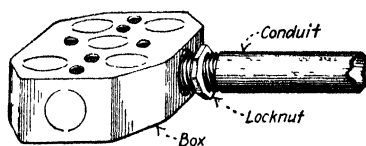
Connecting the ground wire with a locknut. First step, locknut screwed back and contact faces of box and locknut scraped clean.
